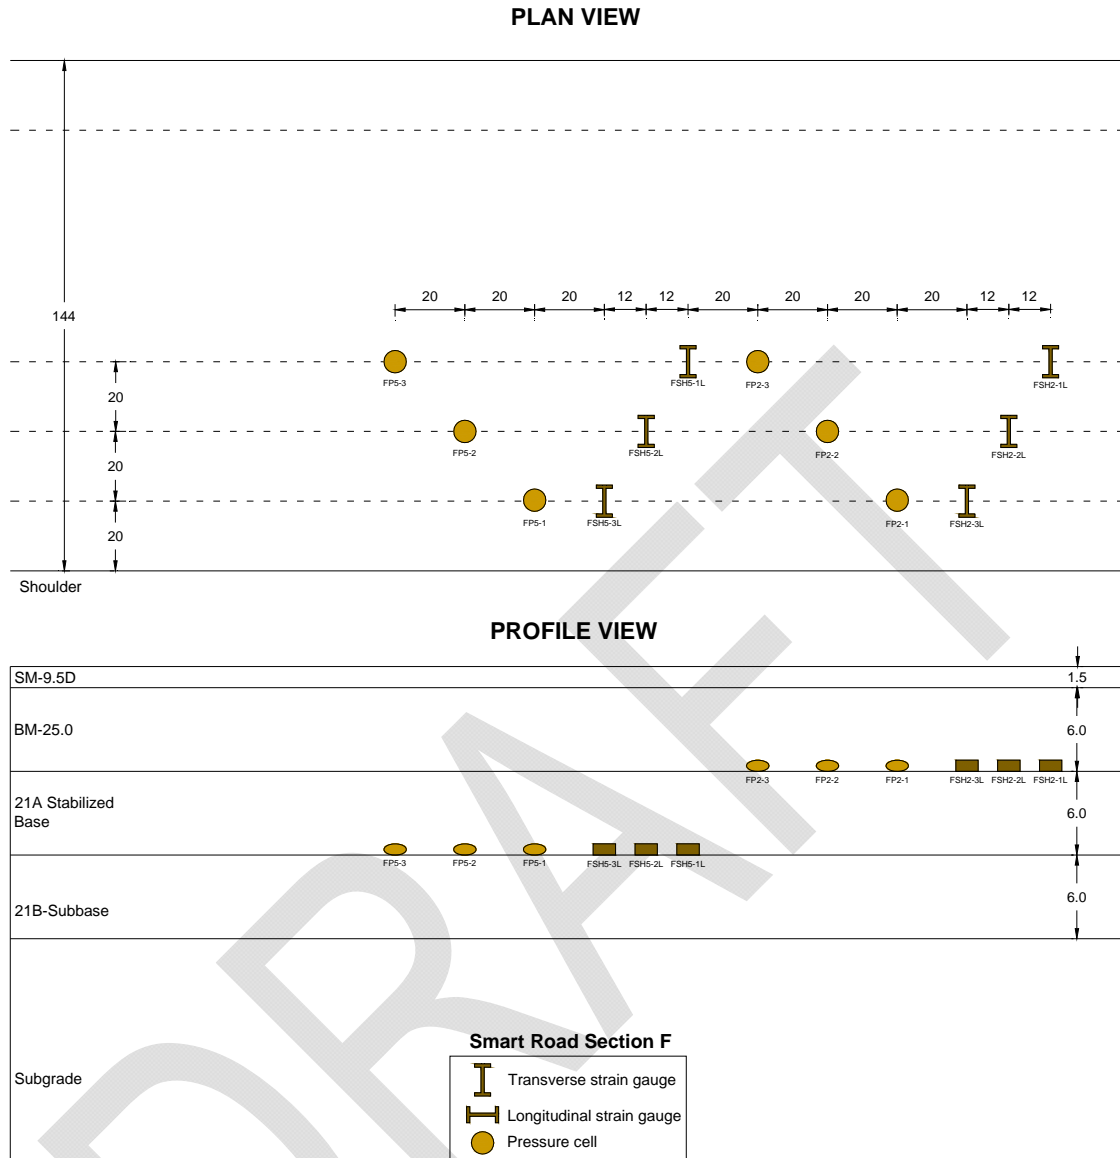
Plan and profile view of pavement structure and instrumentation of Section F, Virginia Smart Road
